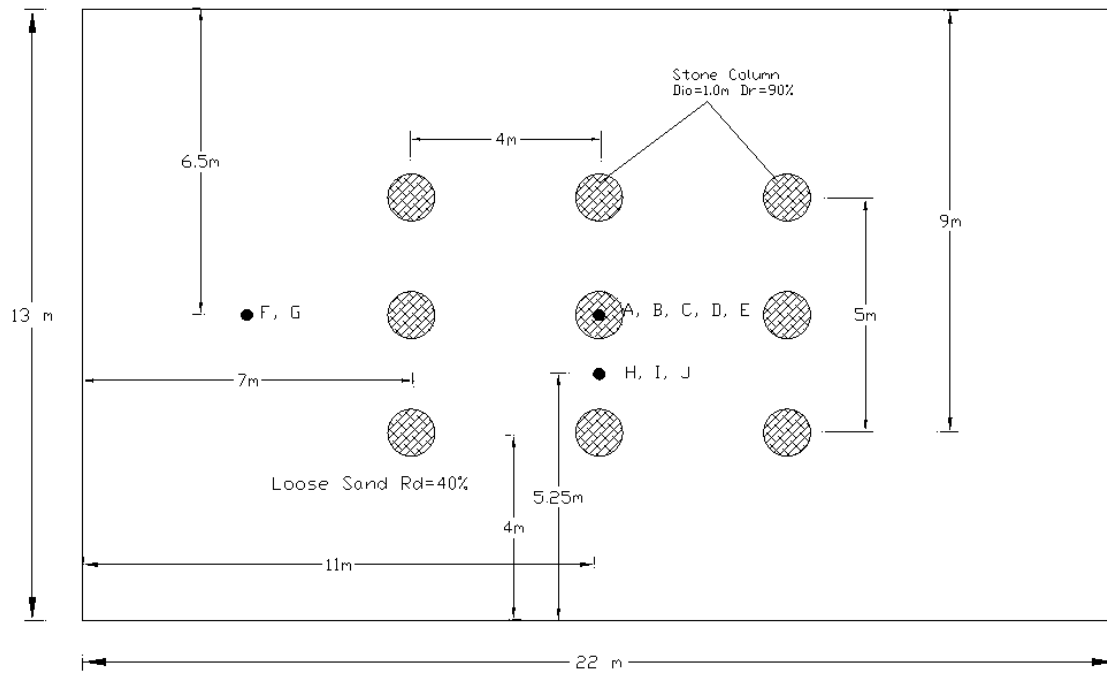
(c) Benchmark model with Stone Column (Plan)
